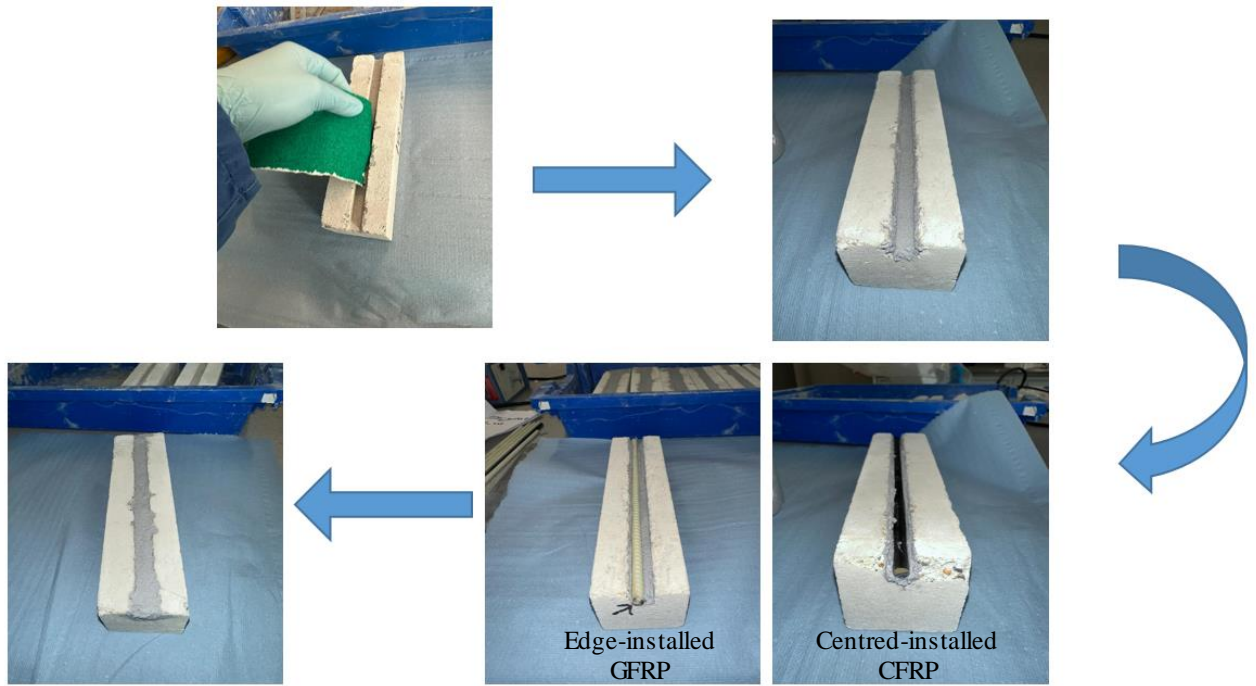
NSM-FRP retrofitting of concrete specimens.
